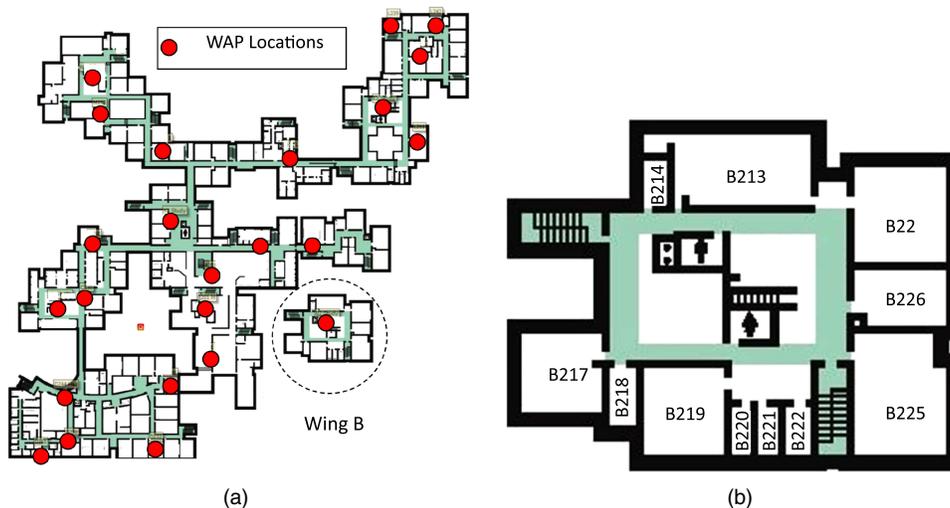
Floor plan and location of WAPs for (a) 2nd floor of Parkland College; (b) for Wing B
